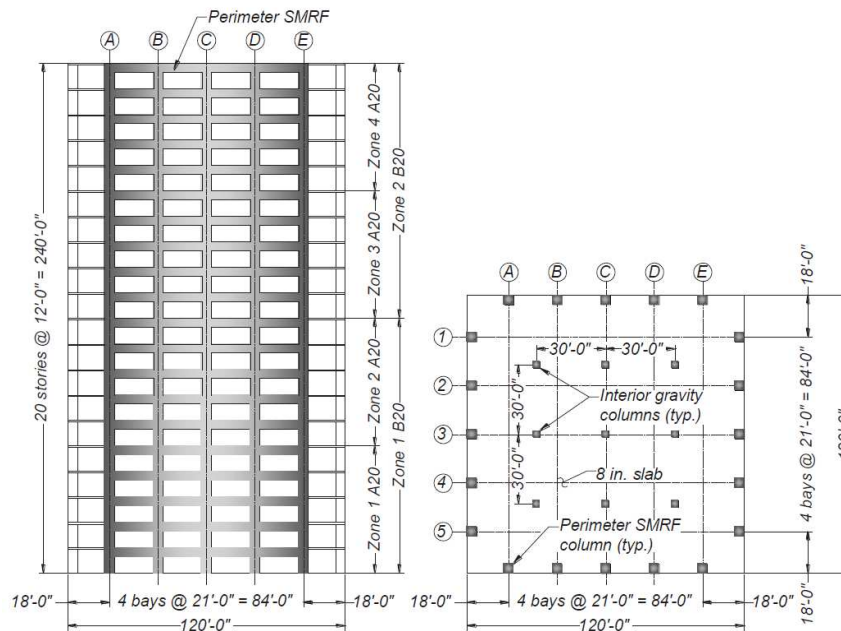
Elevation (Left) and Floor Plan (Right) of Archetype Buildings (used with permission from Visnjic 2014)
